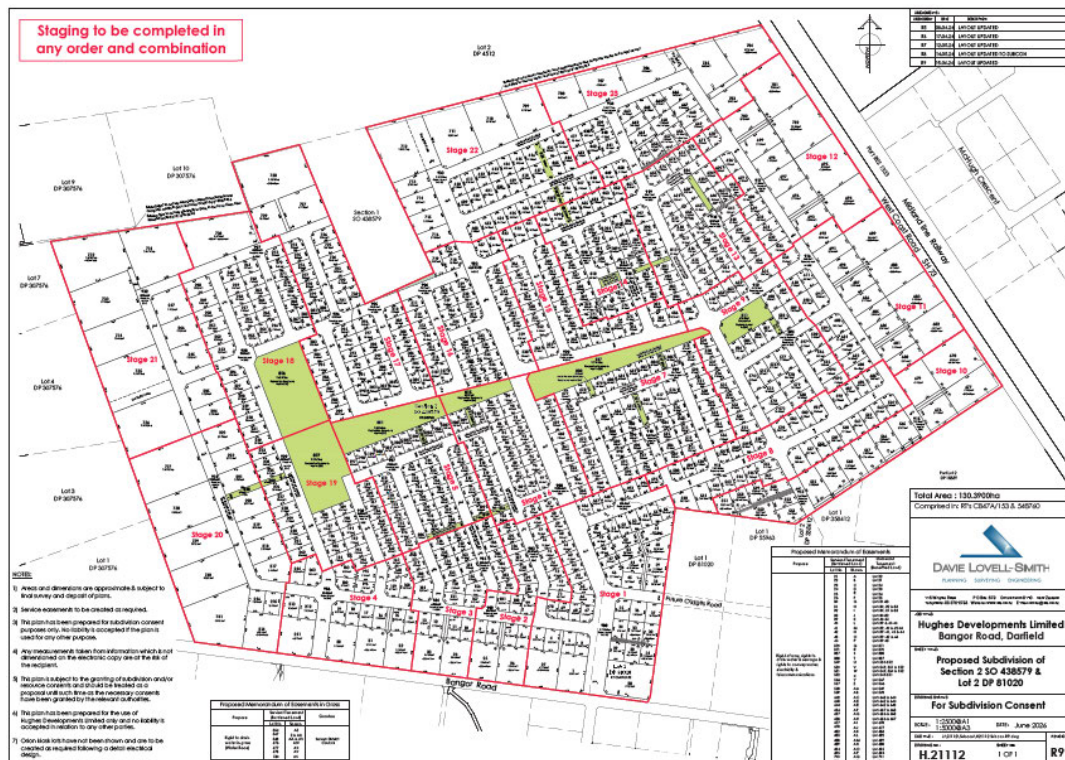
Proposed Subdivision Layout [Source: Davie Lovell-Smith]
